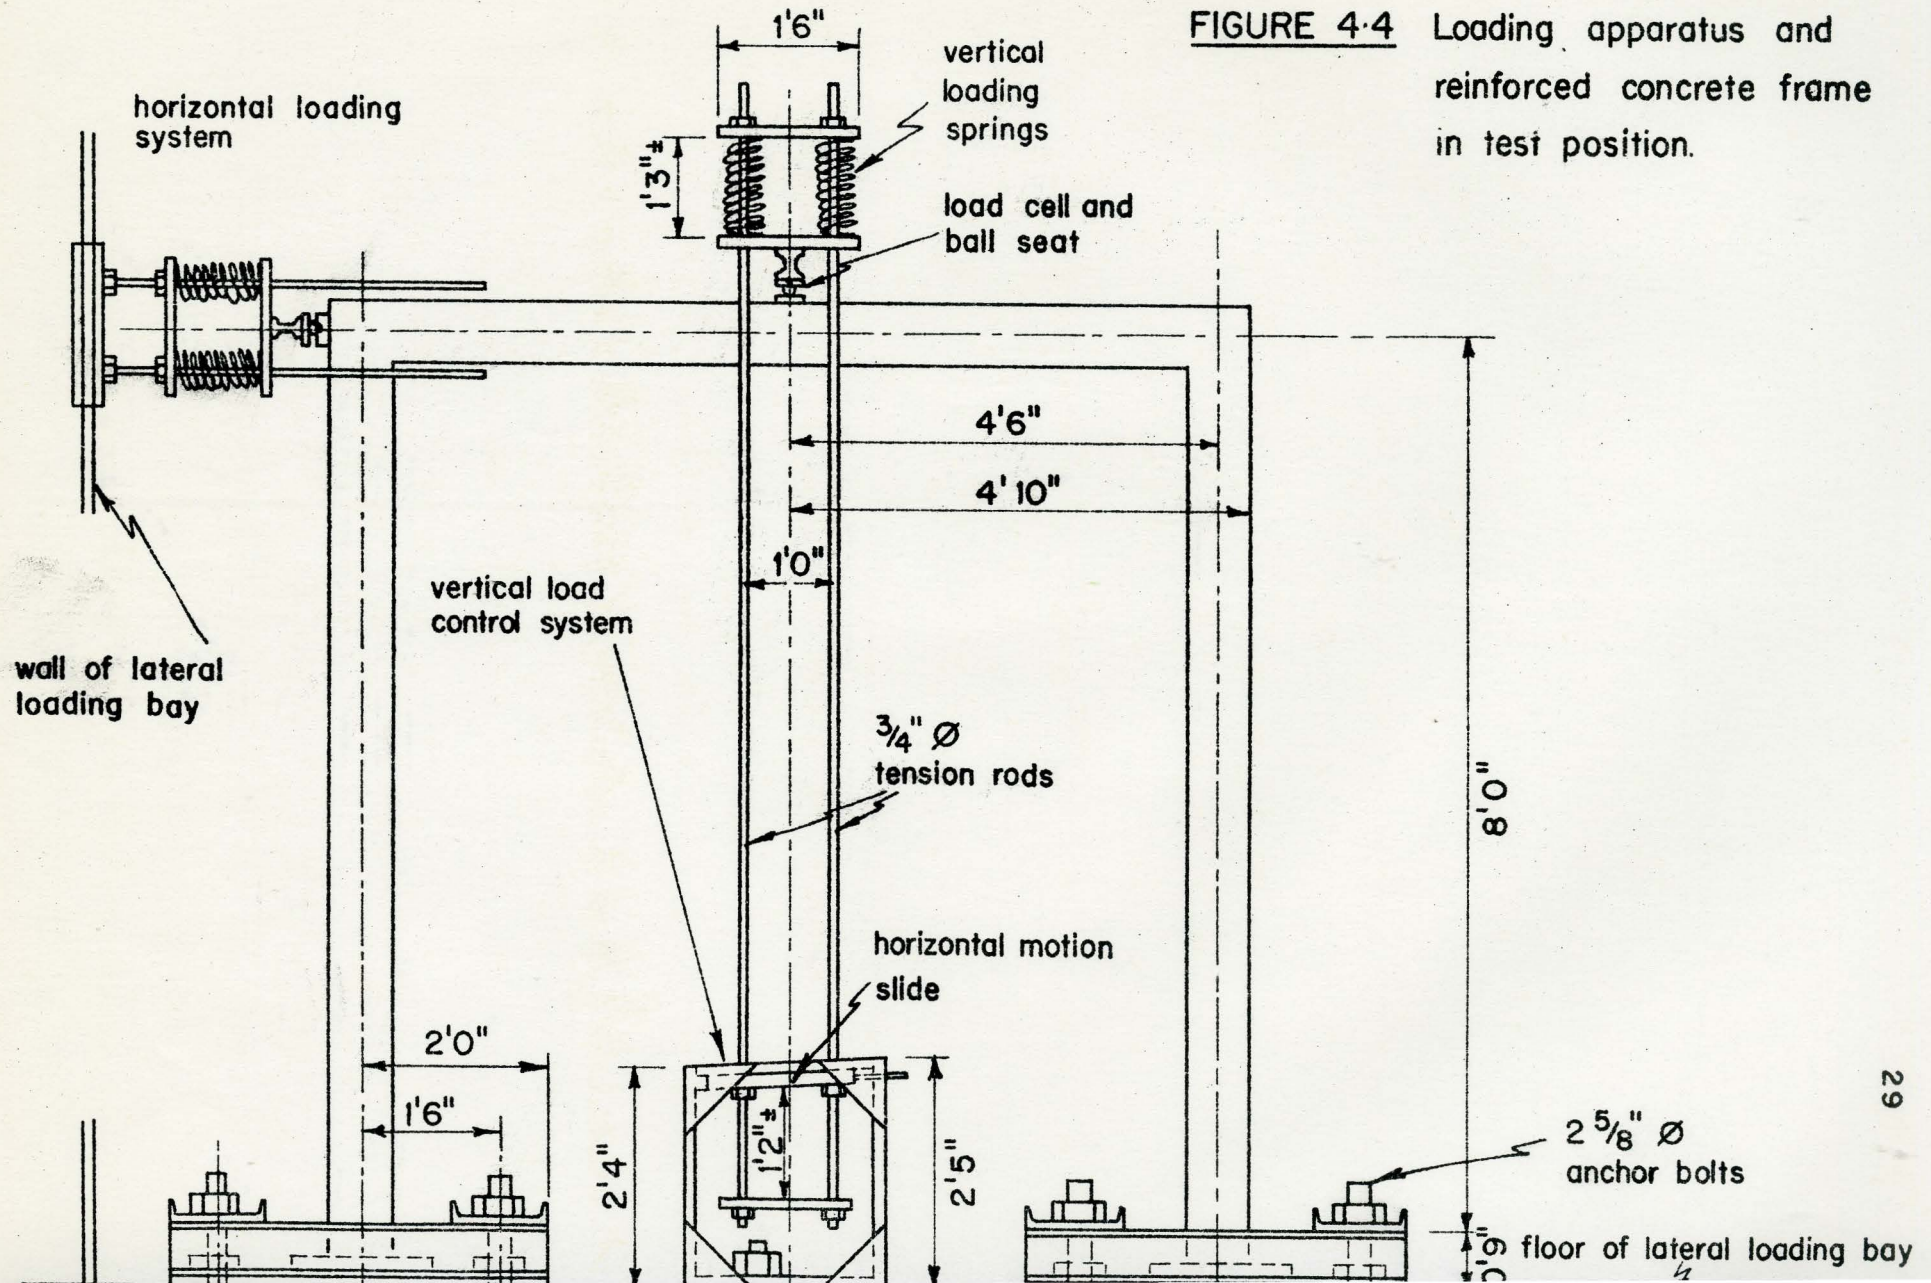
Loading apparatus and reinforced concrete frame in test position.
